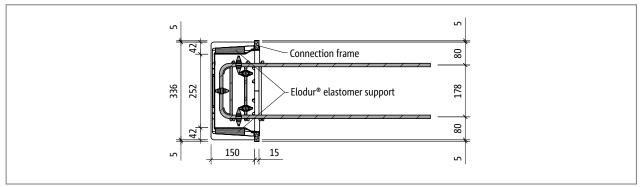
Schöck Tronsole® type Z-VH+VH-T: Horizontal cross-section
